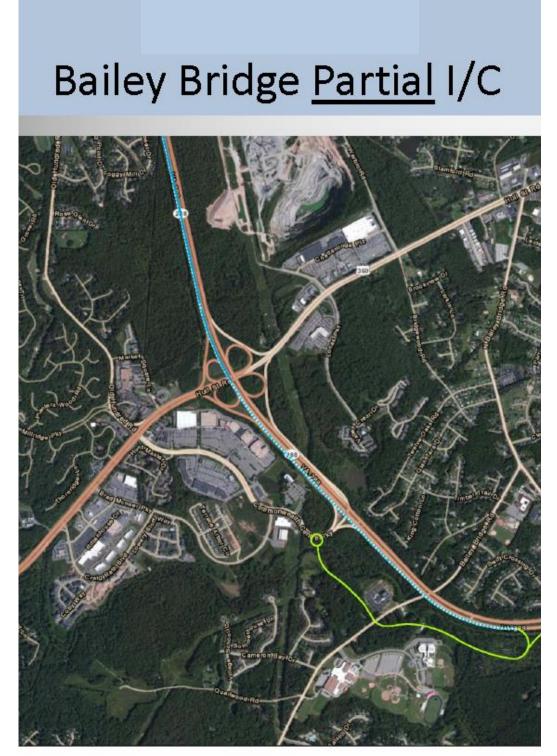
Concept #7 – Northbound Route 288 Off-Ramp to Bailey Bridge Road and Concept #8 – Route 288 at Bailey Bridge Road - Partial Interchange with Northbound Route 288 Flyover
